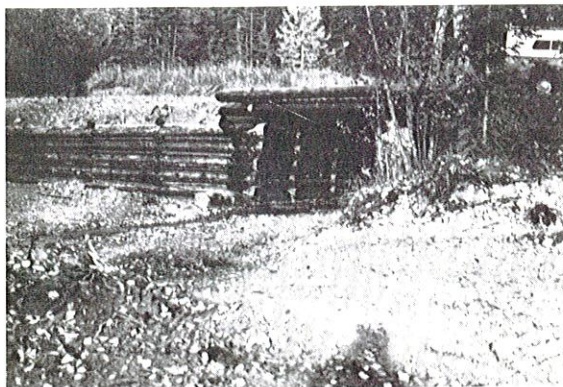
PERMANENT TIMBER BRIDGE. Note the winged abutments for protection and erosion control.
